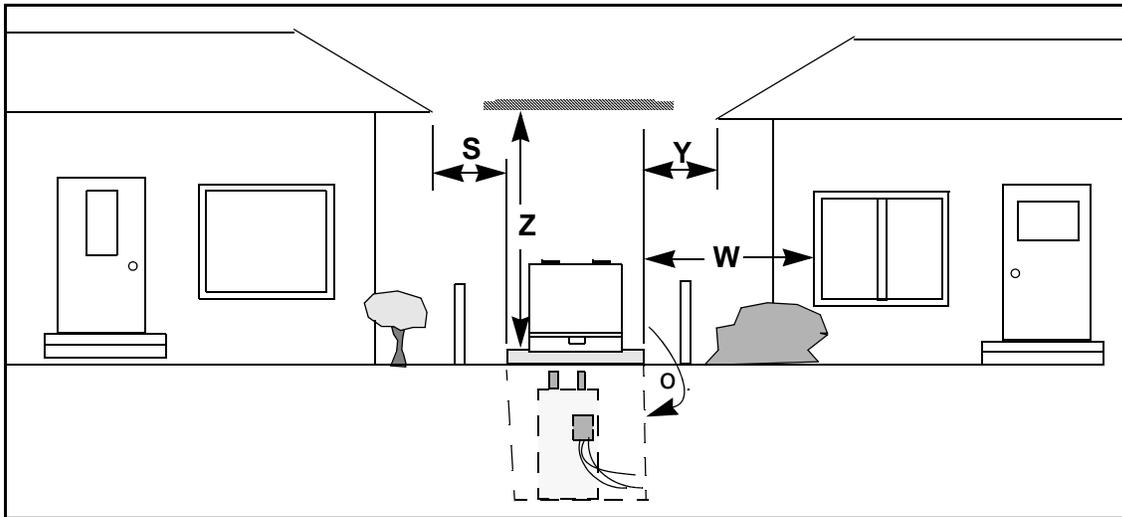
Minimum Separation of a Mineral-Oil-Filled Transformer from a Building
